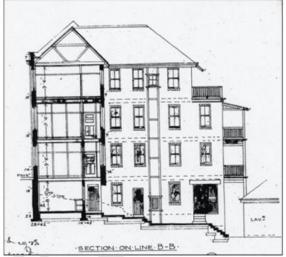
Sections and partial elevation of the proposed northern wing and addition of the building which shows elements such as the proposed partition walls to the cubicles (at left) and open verandahs at the eastern end of the proposed wing (at right). (Source: City of Sydney Archives, 0540/25)
